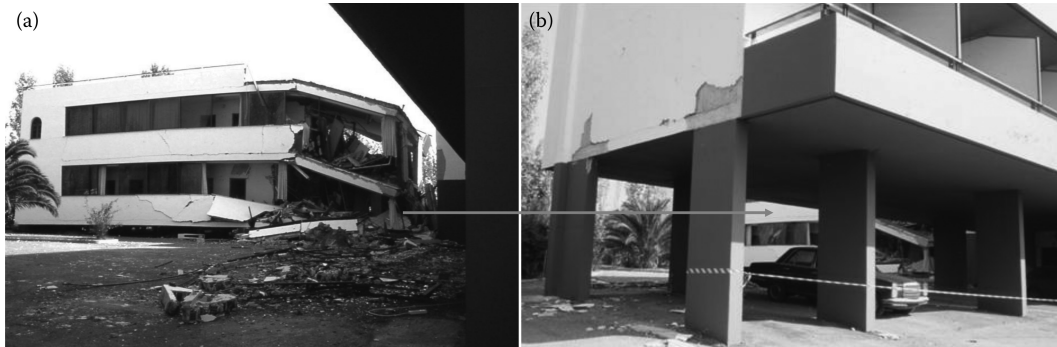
(a) Collapse of open ground storey building; (b) collapsed building shown at the background; similar building at the foreground is still standing with large ground storey drift.
